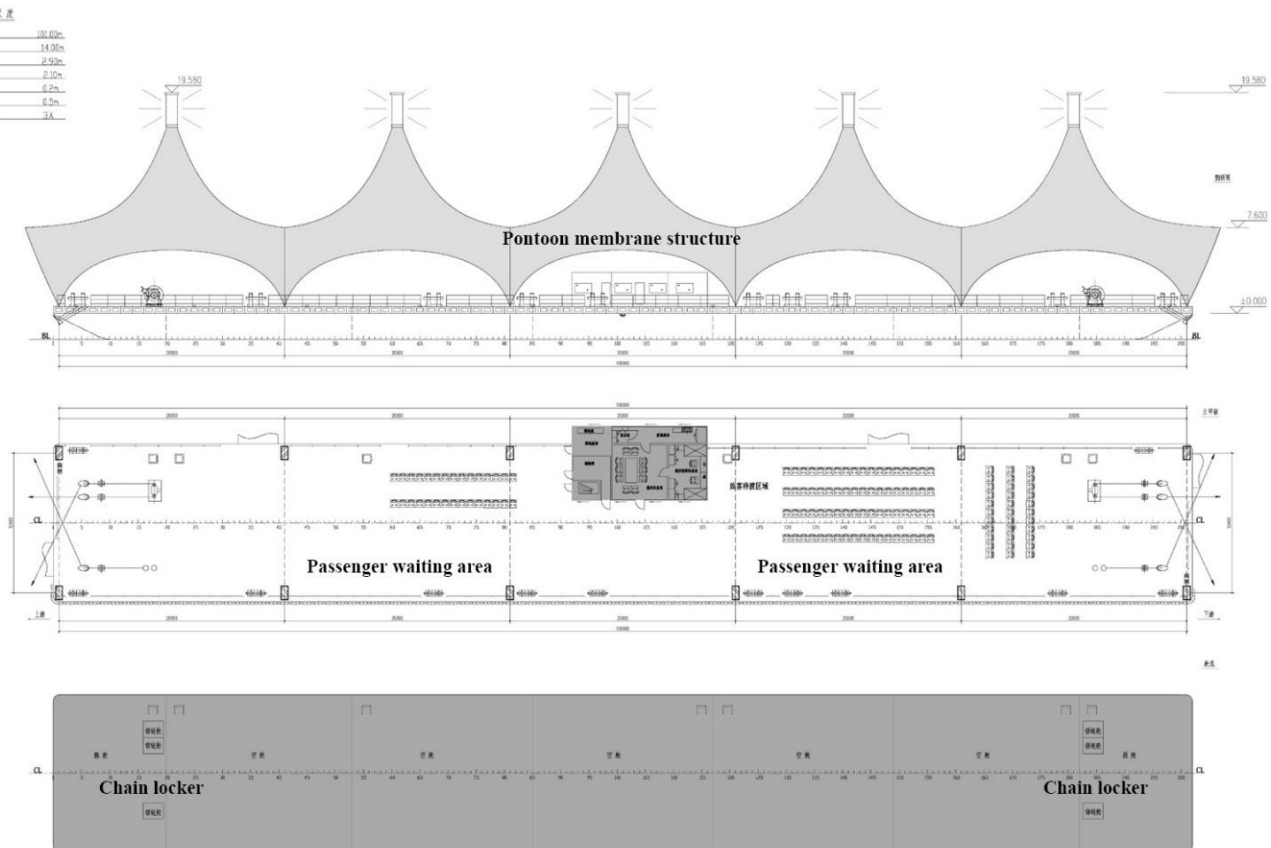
New floating pier plan and facade (Source: Zhouqi Studio).
